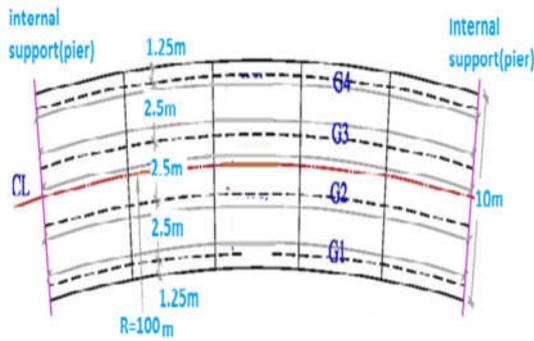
Plan of the central span of typical curved bridge with 10m deck width.
